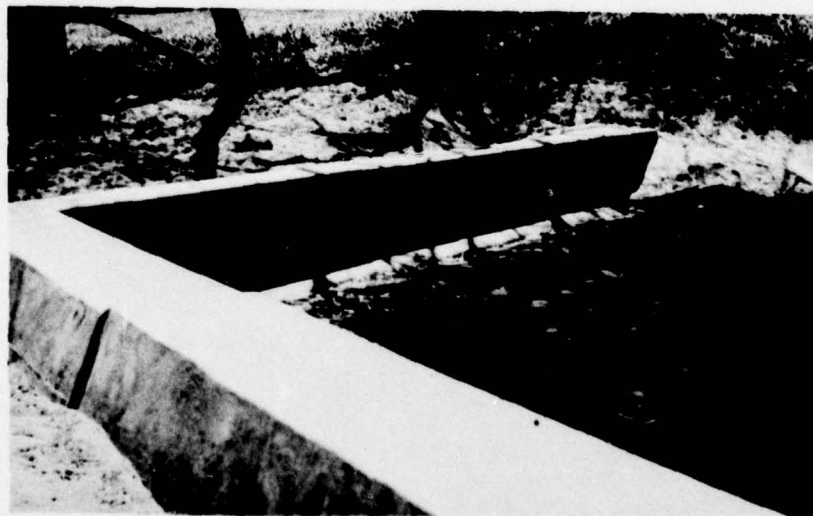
Right abutment gravity cap wall added in the 1976 reconstruction; this wall was topped by one inch on November 7, 1977
